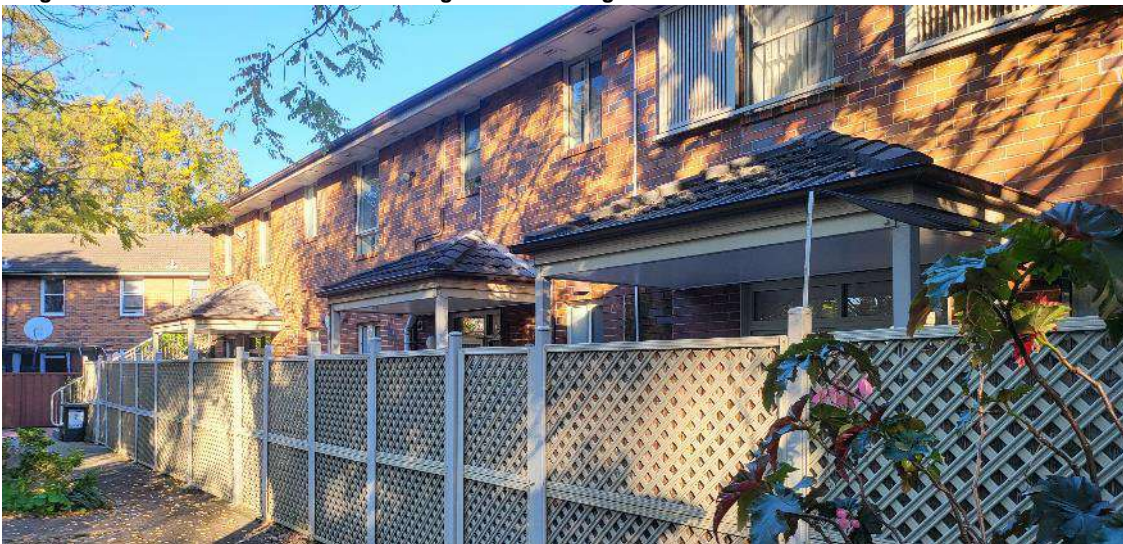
Rear view of residential dwelling on Lot A facing southwest.
